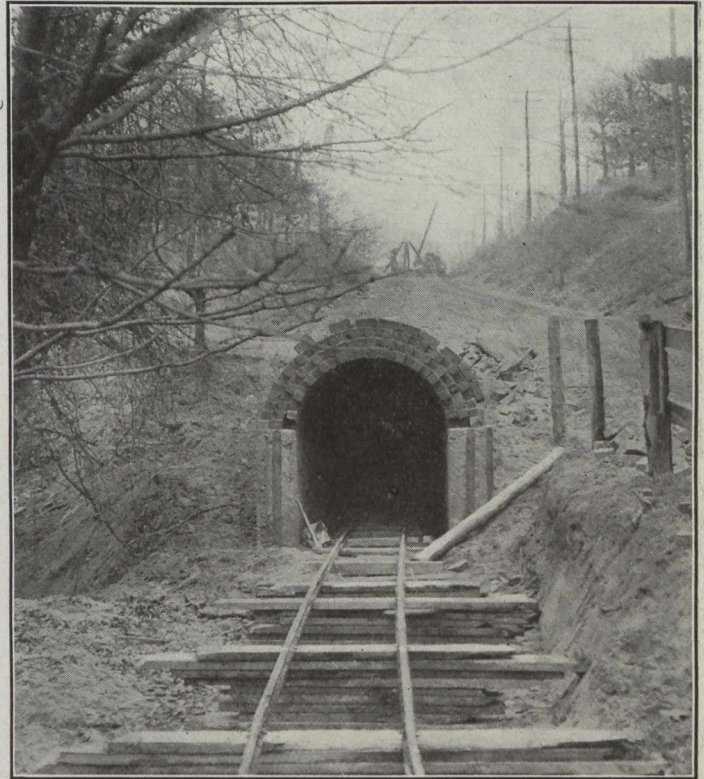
End of Bloor Street Tunnel Just Before the Section on Piles Shown in Fig. 1.
